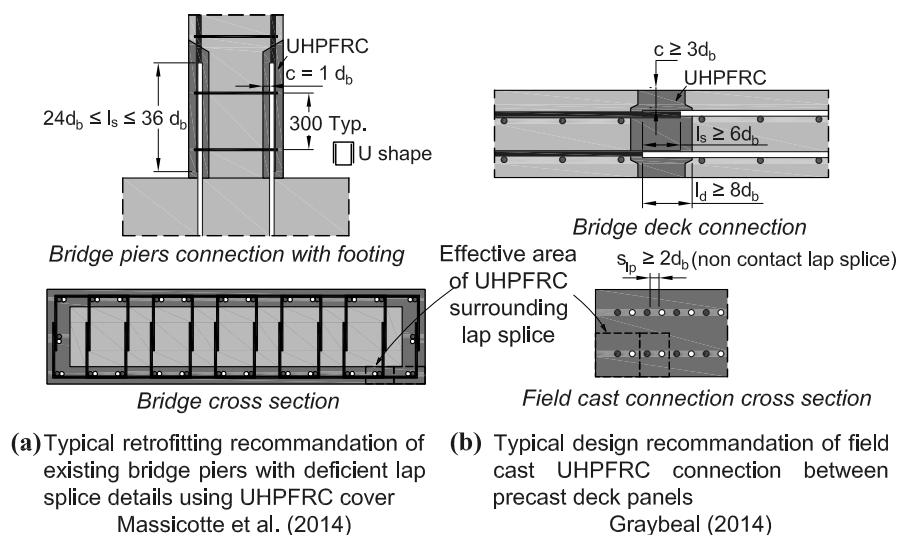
Typical example of lap splice connection in UHPFRC
